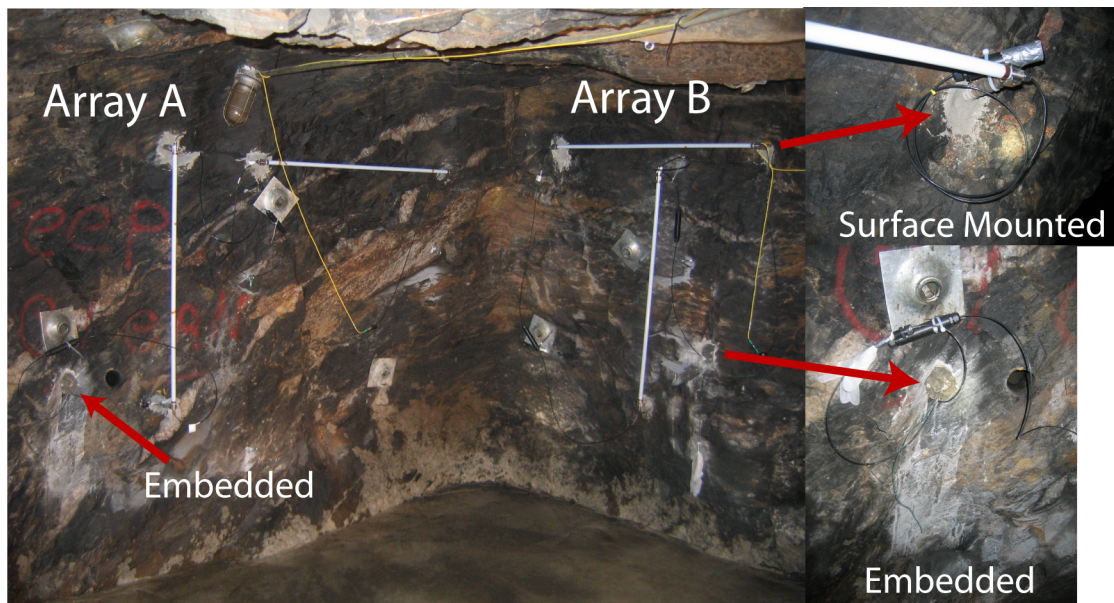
Photographs of installed OS3600 gages. Photograph showing the perpendicularly oriented surface-mounted sensors of the two arrays (left). Holes filled with grout (denoted by arrows) show the location of the two embedded sensors. Photographs on right show close-up views of sensor mounting techniques. The ends of the surface-mounted sensors are welded to the heads of steel rock bolts epoxyed into the rock (top). Embedded sensors are place into a 6.25 cm diameter drillhole ~2 m deep and surrounded by grout (bottom).
